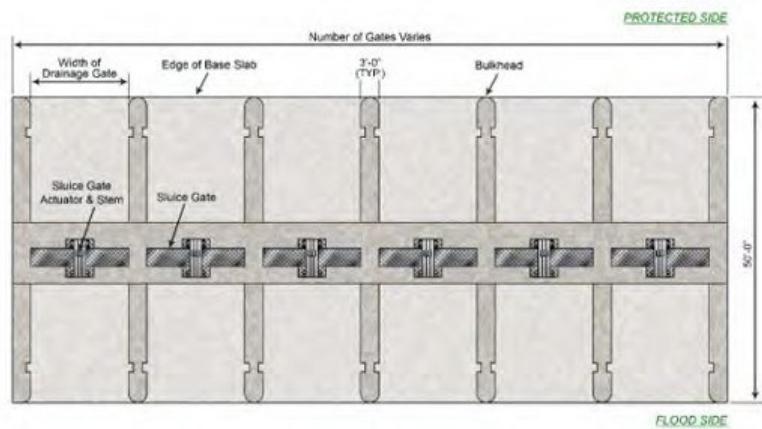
Typical Sluice Gate Control Structure (6 gates) - Plan View
